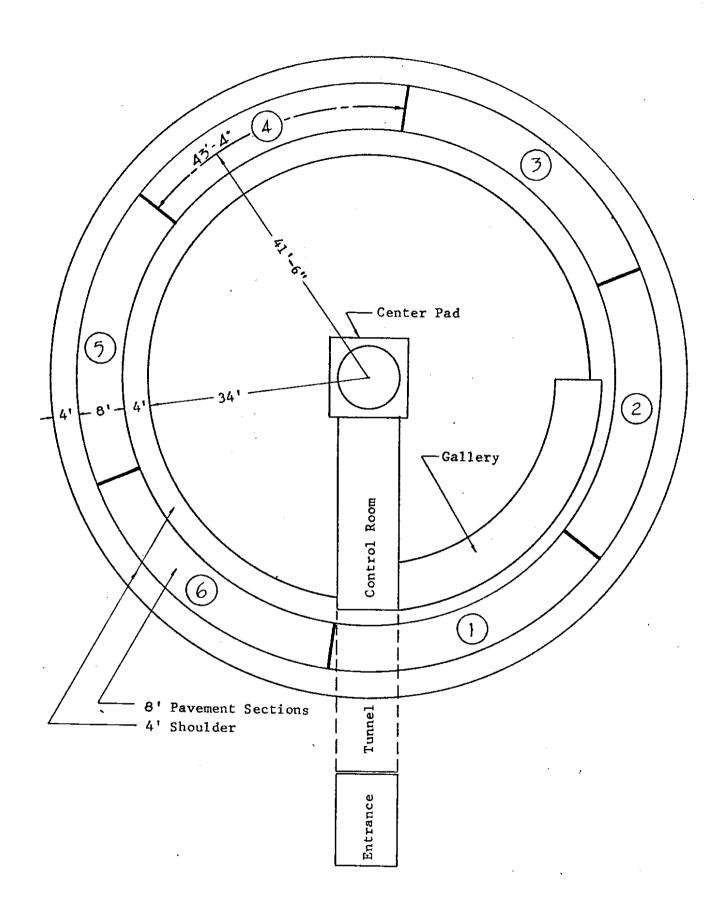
PLAN VIEW OF PERMANENT STRUCTURE ANE THE PAVEMENT SECTIONS, RING 1.
